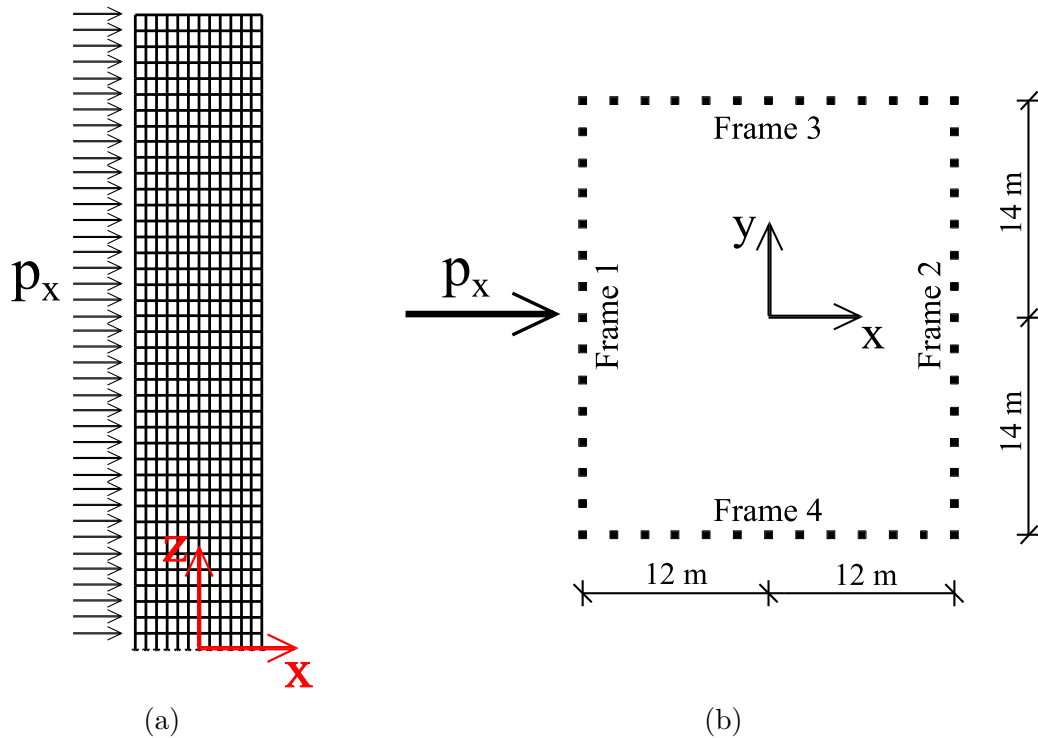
Framed tube structure. (a) Front view; (b) Floor plan
